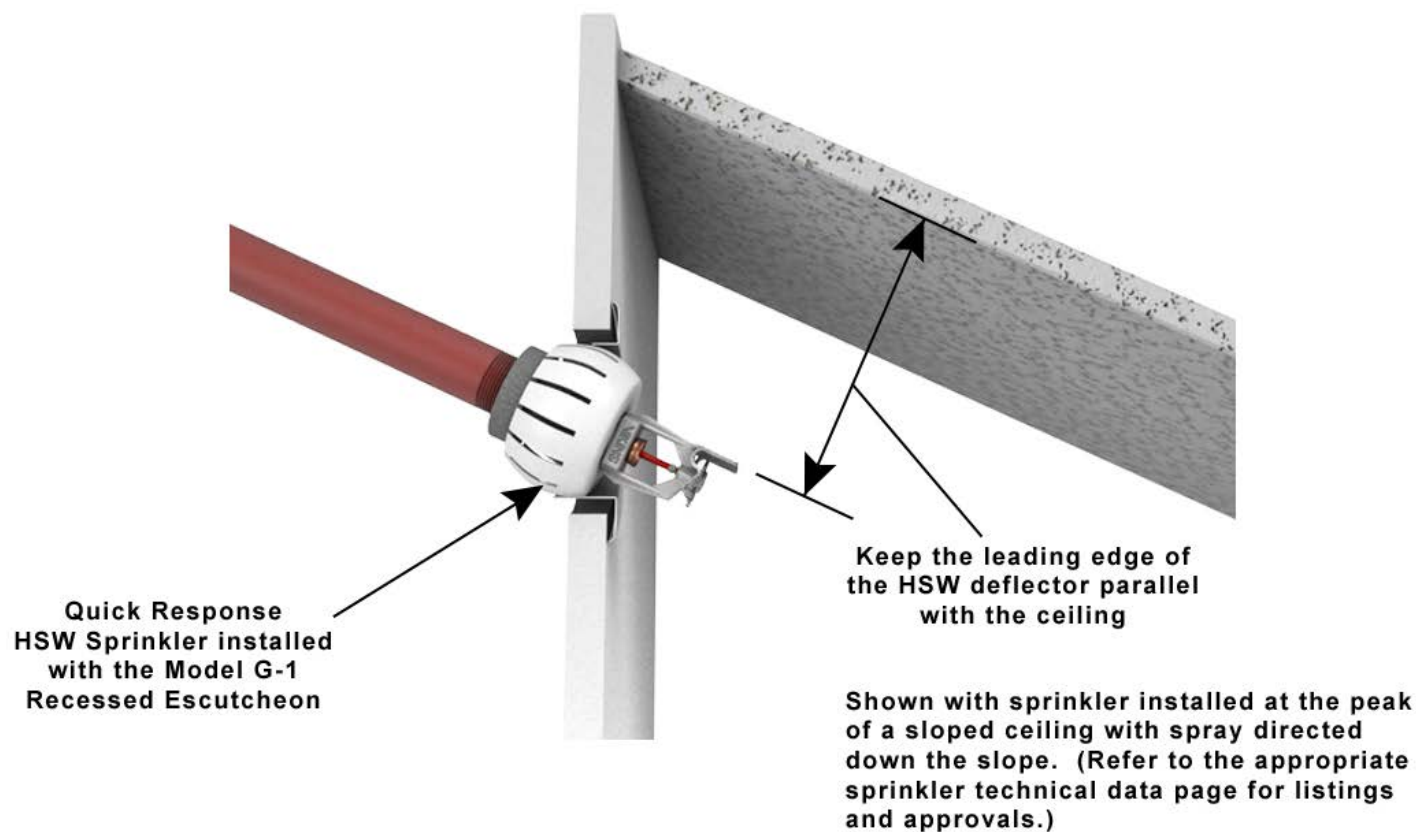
Model G-1 Recessed Escutcheon Installed with a Residential HSW Sprinkler below a sloped ceiling.
